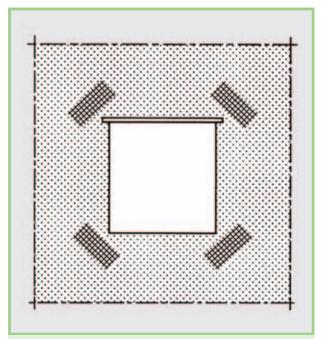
Additional diagonal reinforcement around the corners of the window.
